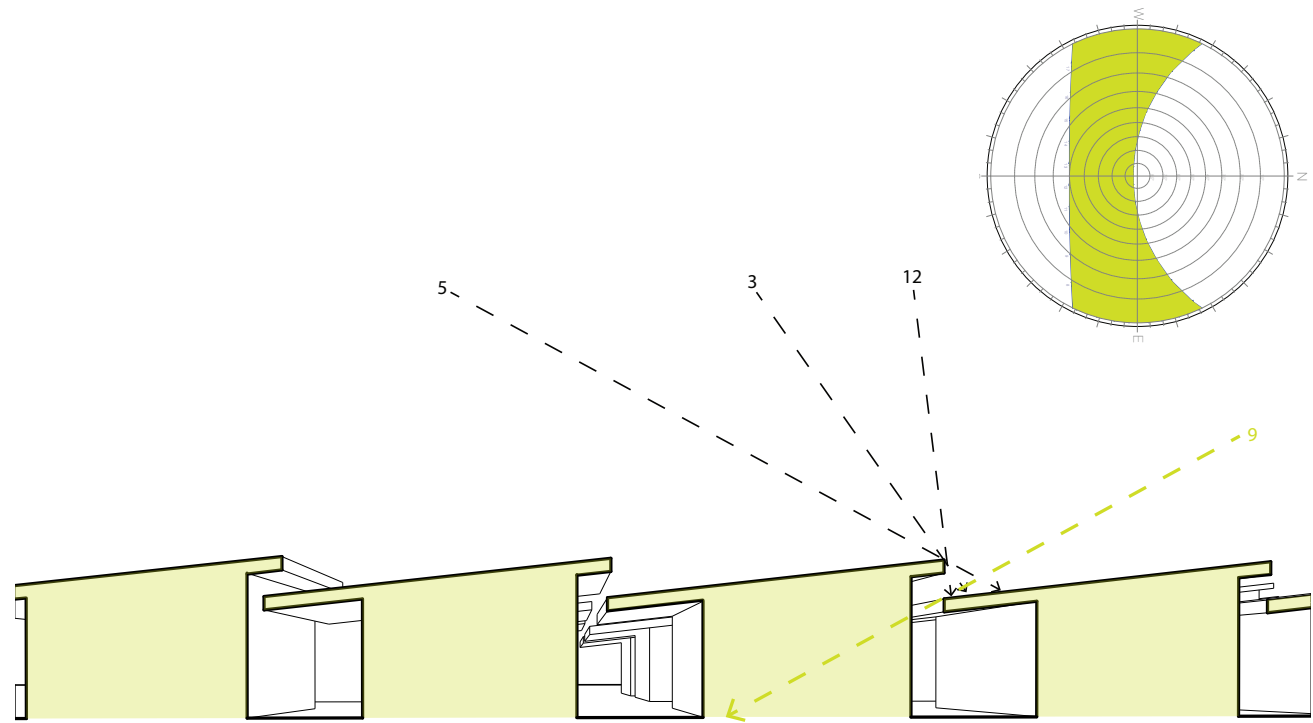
SECTIONAL DIAGRAM SHOWING ROOF OVERHANGS SHADING OUTDOOR PORCHES
